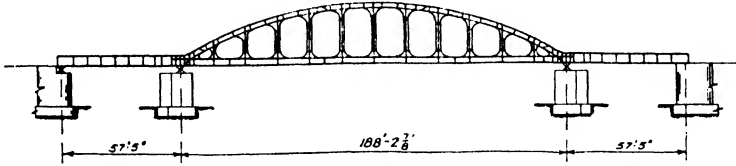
SKETCH ELEVATION OF BRIDGE WITH PORTAL FRAME GIRDERS
